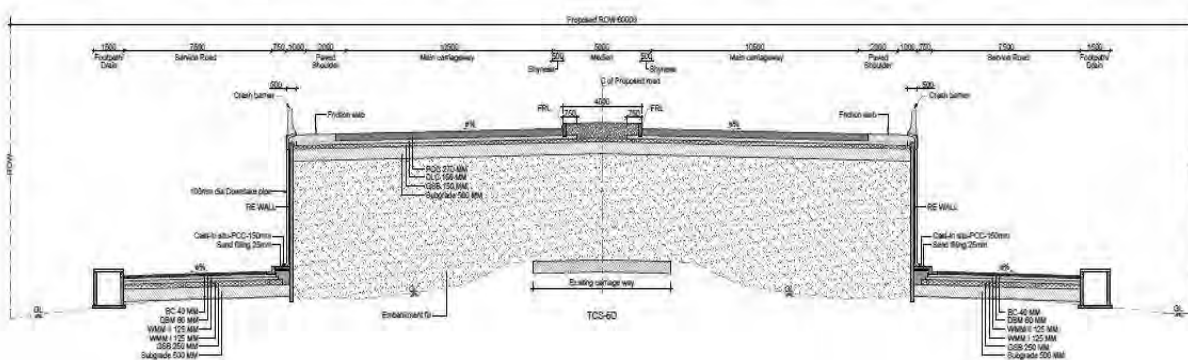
TCS-6D Typical Four Lane Underpass Cross Section with Service Roads
